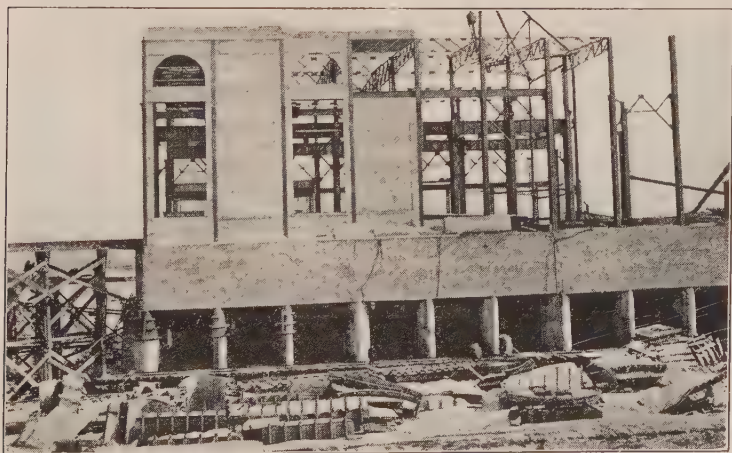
CONSTRUCTION VIEW OF THE POWER HOUSE, CEDARS RAPIDS
